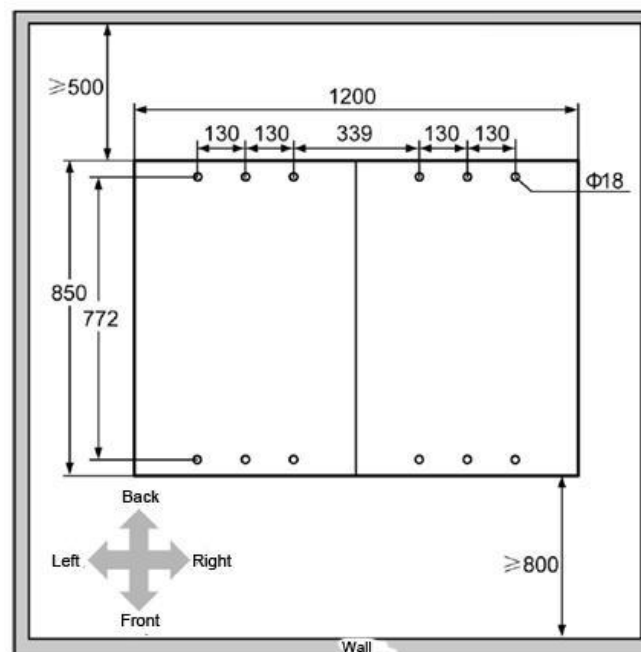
Dimensions of antiseismic kit mounting holes (600 kVA)
